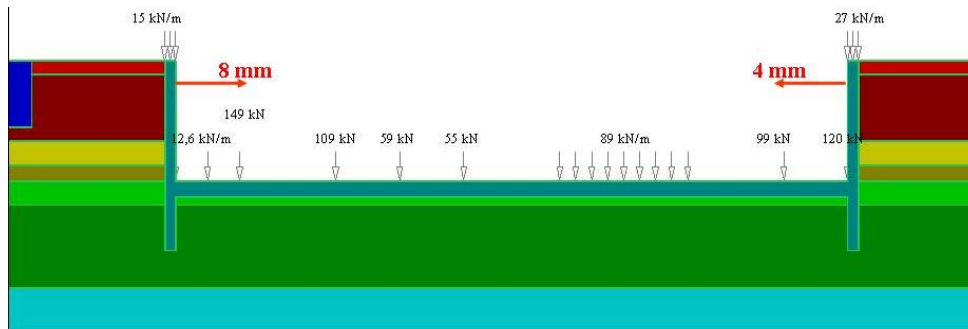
Cross-section A-A and horizontal displacement of retaining wall
